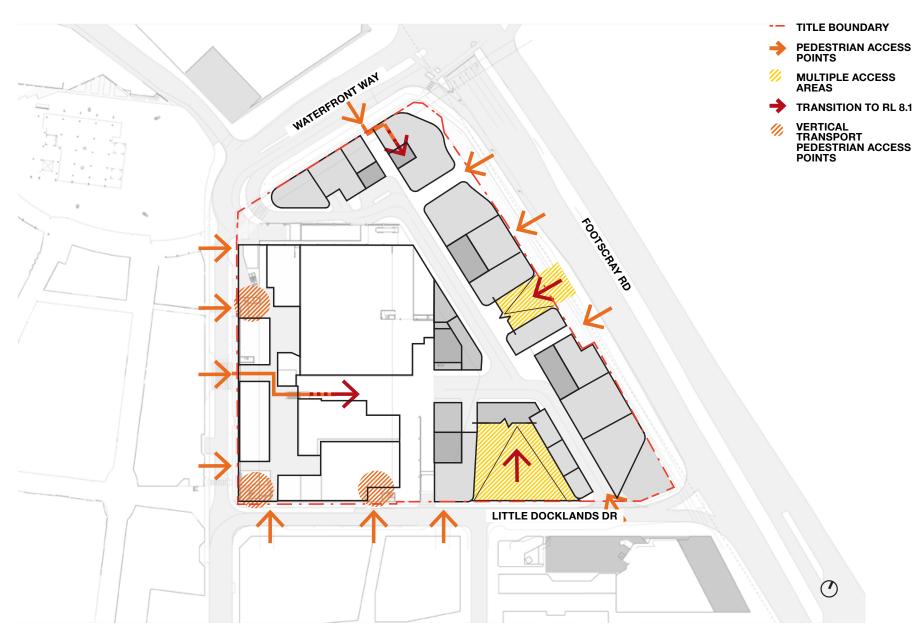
Movement and Parking Plan 3 - Ground Floor pedestrian paths and access points
